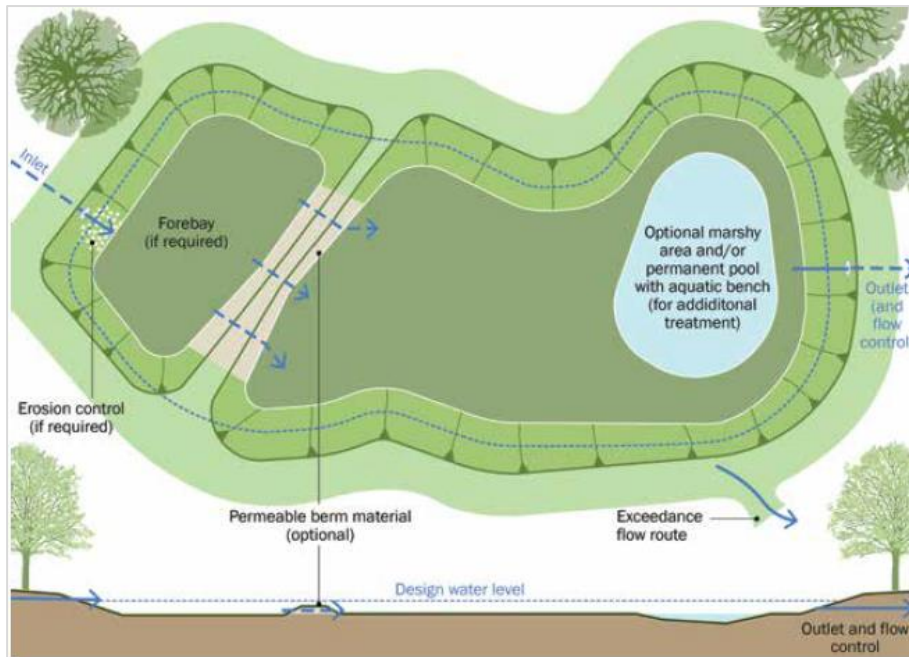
Typical detention basin – plan (SuDS Manual extract)
